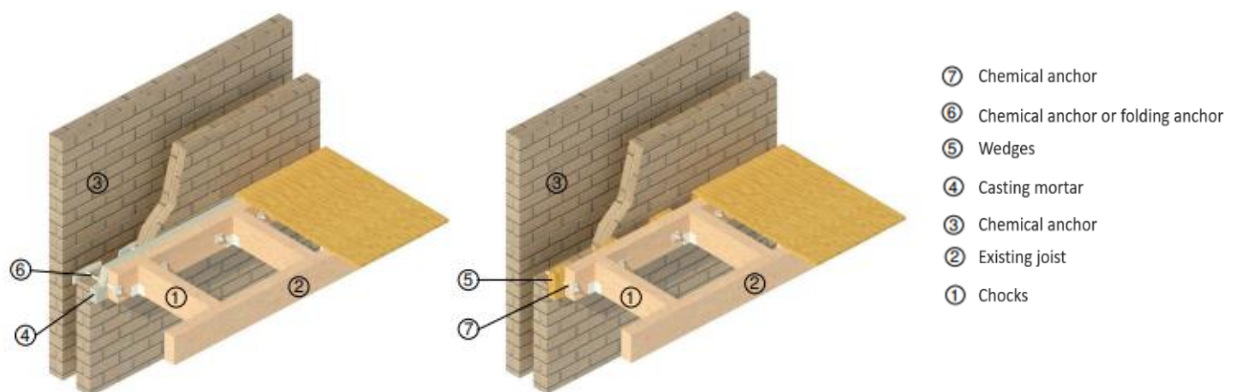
Level 2 strengthening measures in case of joists parallel to the wall (GMC, 2020)
